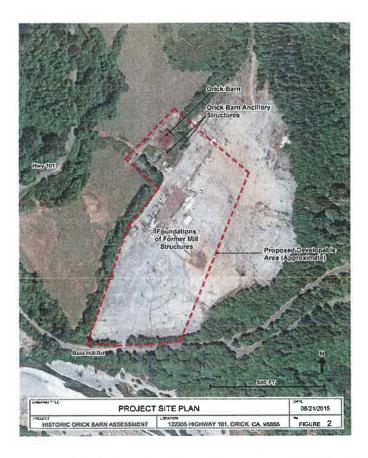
Orick Barn Ancillary Structures SITE PLAN (within the proposed developable PROJECT Site Plan, LACO, Figure 2)
